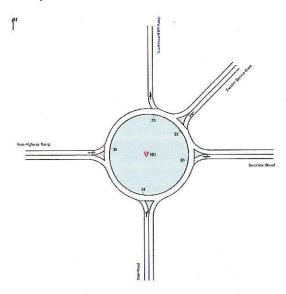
Northern Roundabout No.1 Post Development - SIDRA Layout
